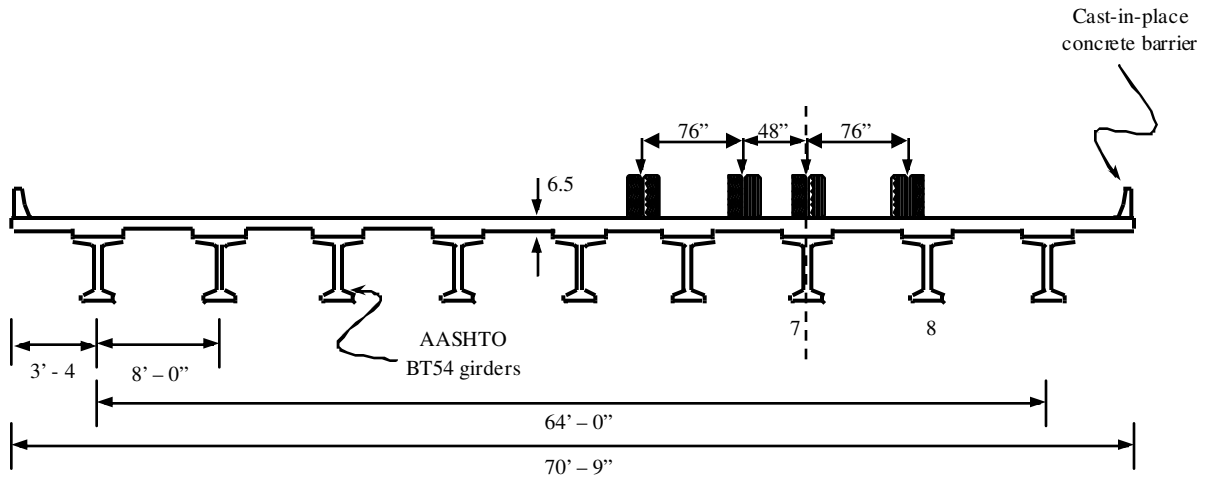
Lane A – Horizontal Truck Positioning (Static Test only)
